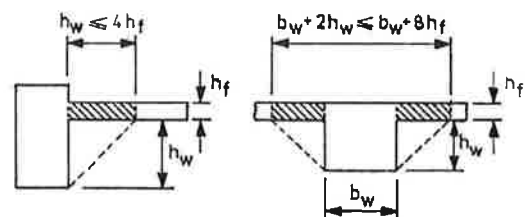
EXAMPLES OF THE PORTION OF SLAB TO BE INCLUDED WITH THE BEAM UNDER 11.8.2.4
